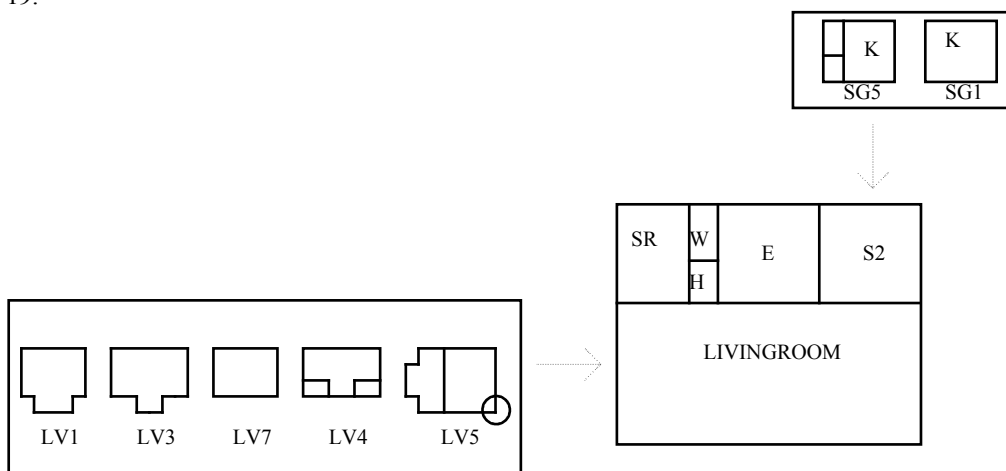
The ground floor plan in the case of P(M1,1G,A21,SG3)
